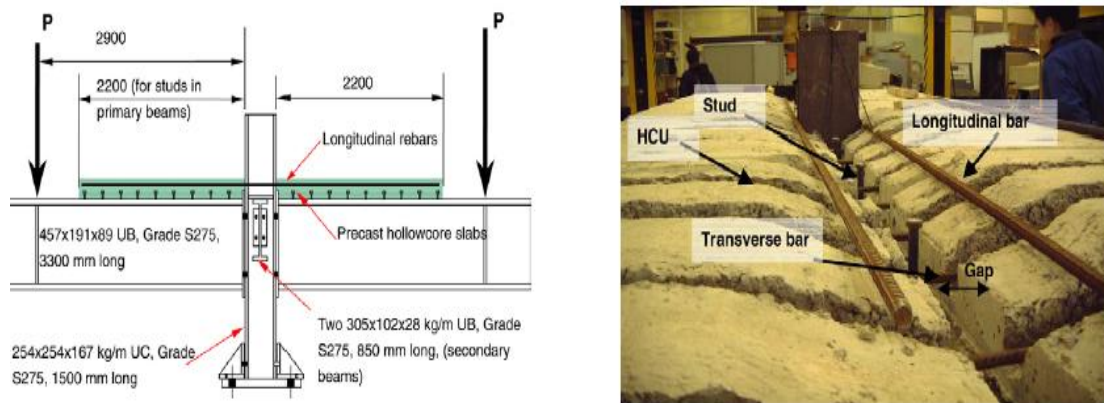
General arrangement of test set-up (Fu and Lam, 2006)
